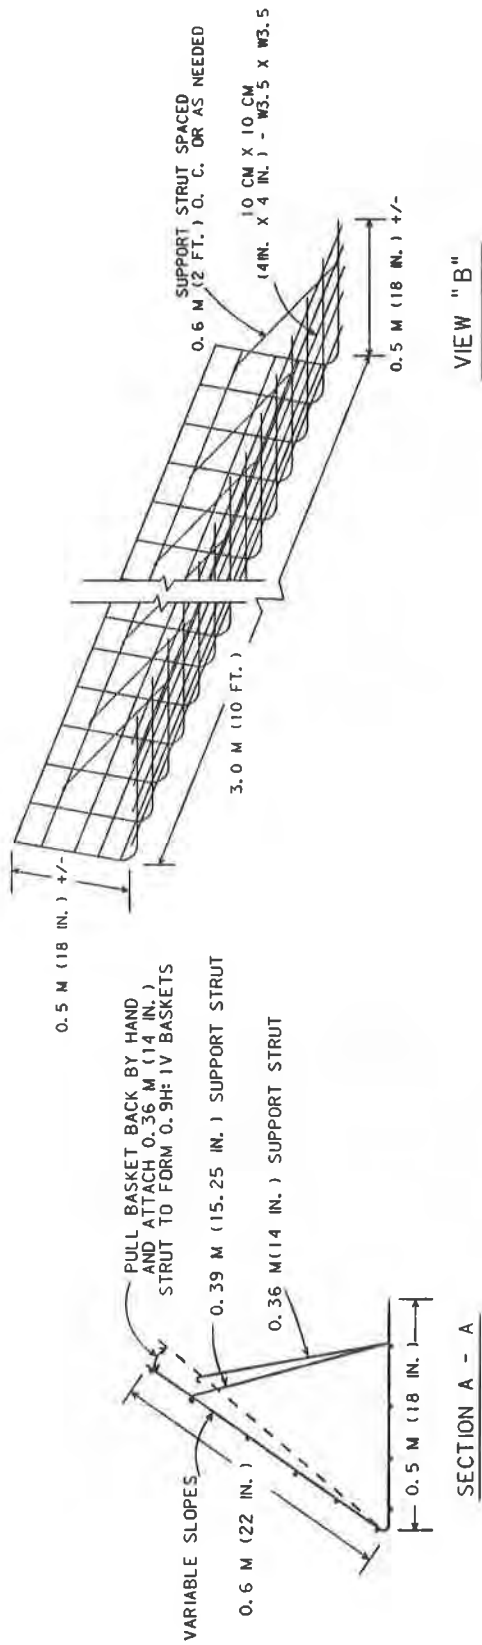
WELDED WIRE BASKET DETAIL
